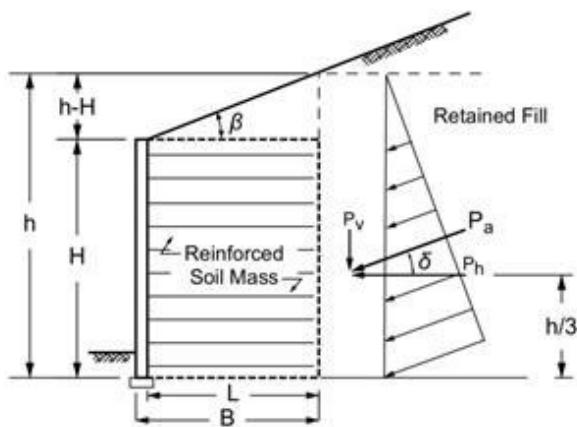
Earth Pressure Distribution for MSE Wall with Sloping Backfill Surface
